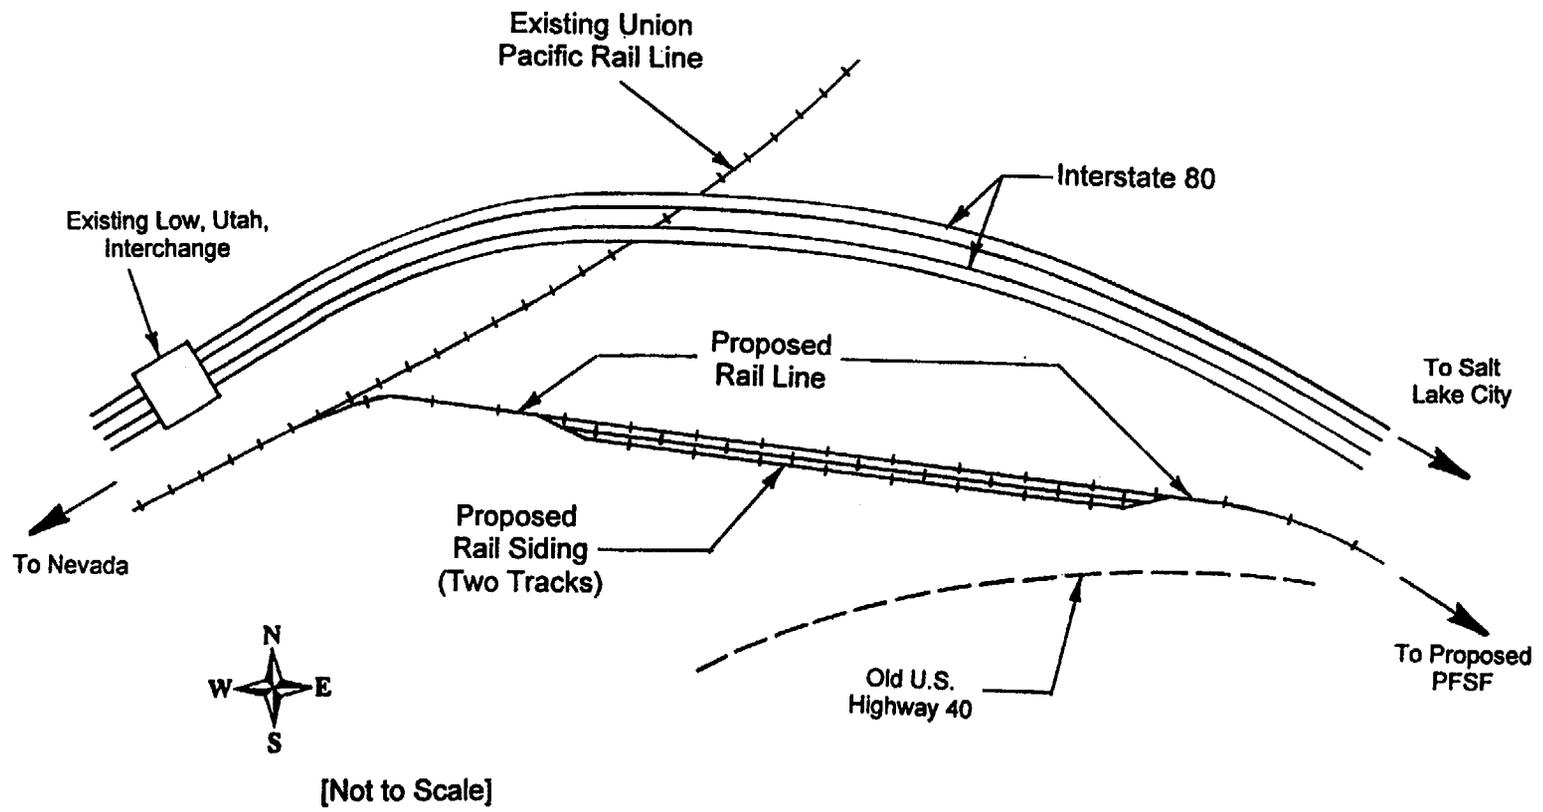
Basic site plan and layout for the proposed rail siding near Skunk Ridge, Utah.
